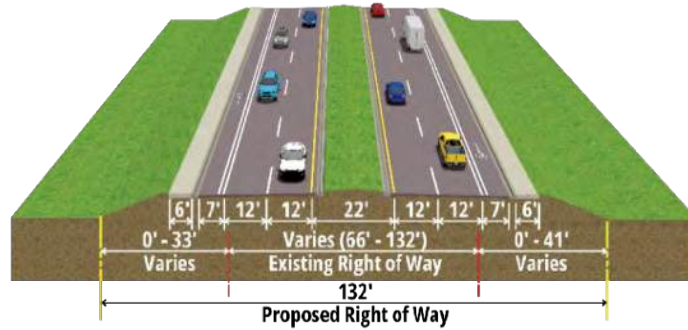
S.R. 60 PREFERRED TYPICAL SECTION 1
